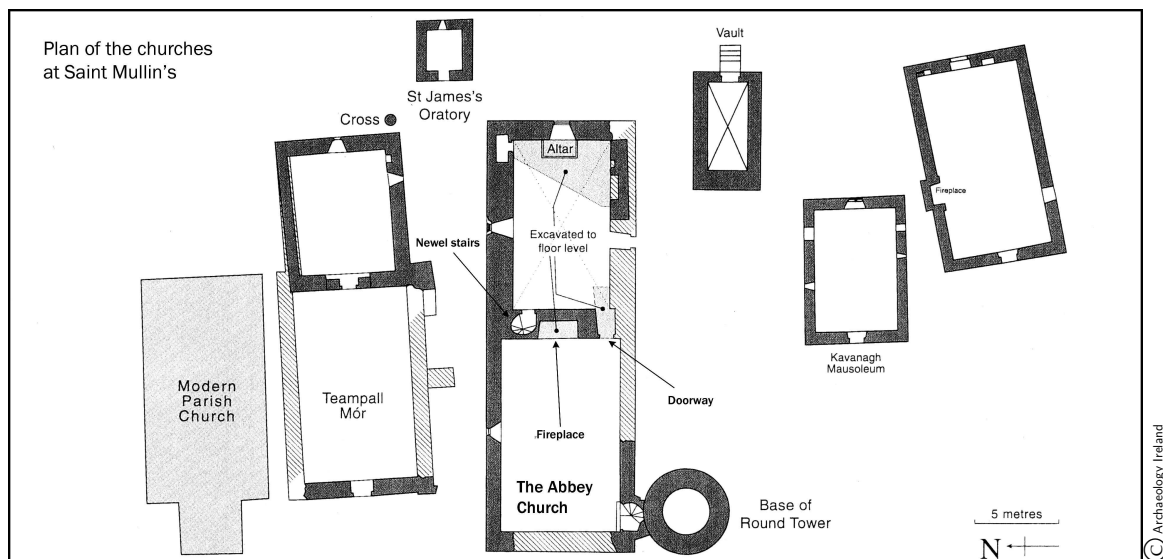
Plan of churches at St. Mullin's, county Carlow. Note the fireplace in cross wall between nave and chancel, facing into the nave in the Abbey church.
